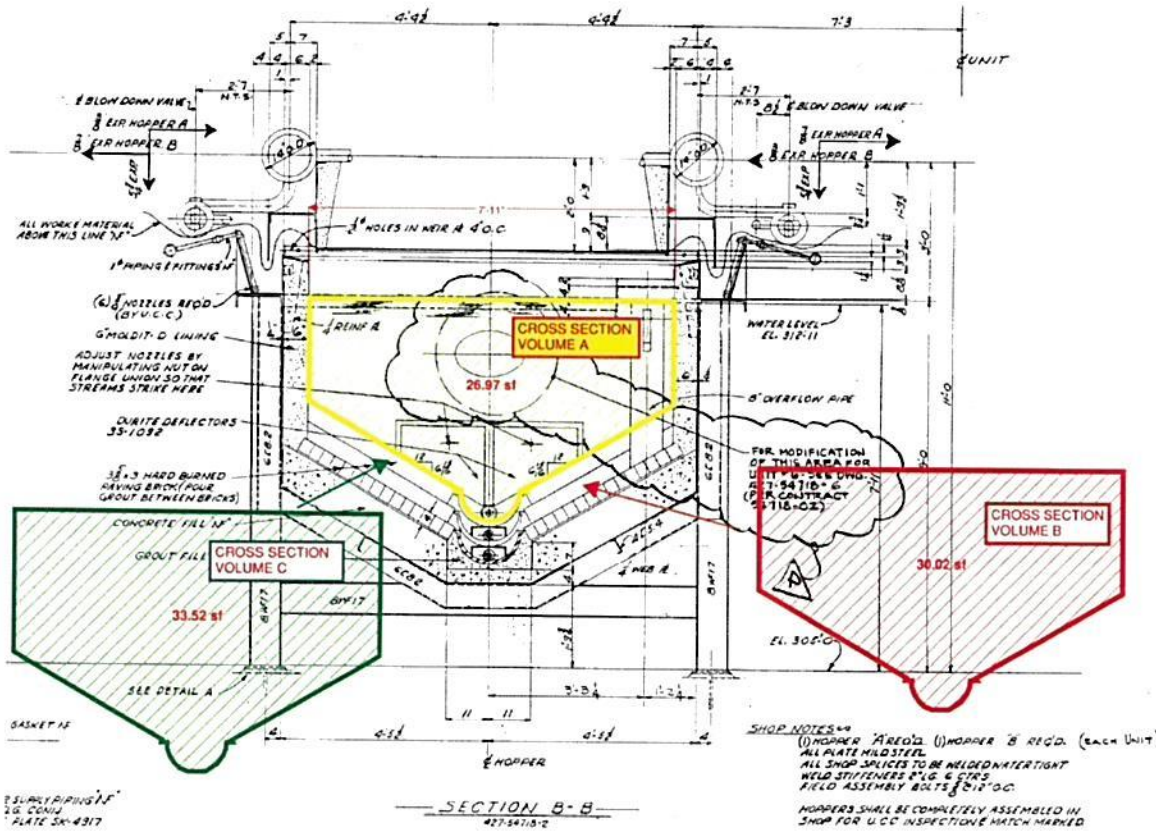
Bottom Ash Hopper Cross Sections (ref. UCC drawing 427-54718-3)
